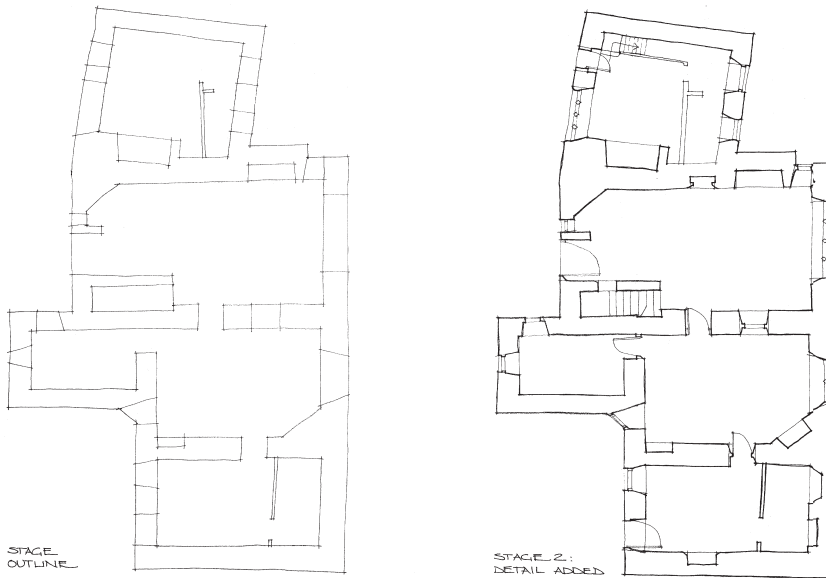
Stages in sketching a ground floor plan – example no. 2.
